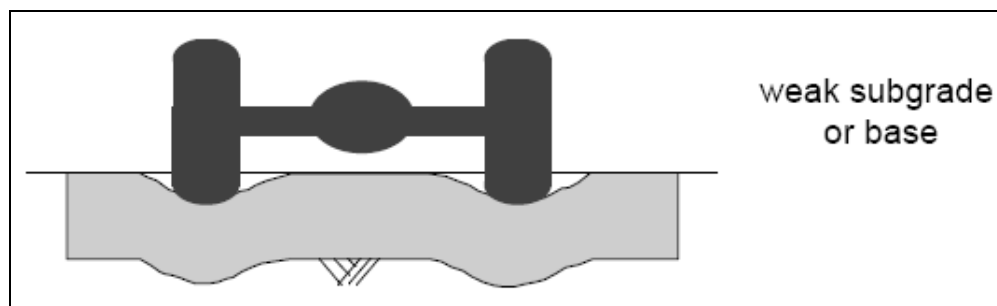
Deformation of the flexible pavement due to weak structure (FHWA Superpave, 1995).
